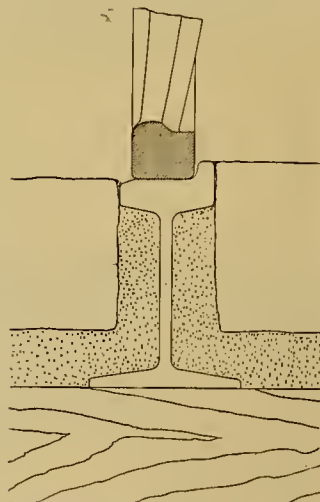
DETAIL OF SECTION OF PROPOSED WHEEL AND RAIL.
